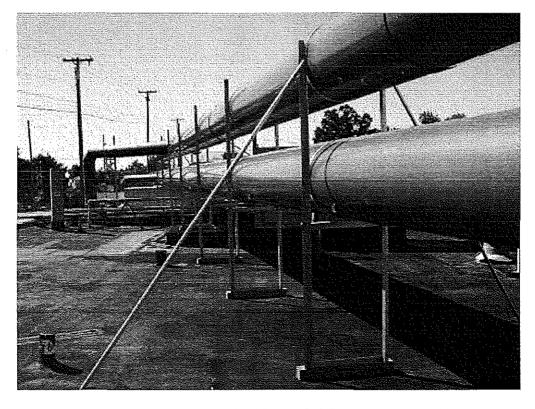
(Photo 10): Twin 24" extruded ducts for scrubber #4.
